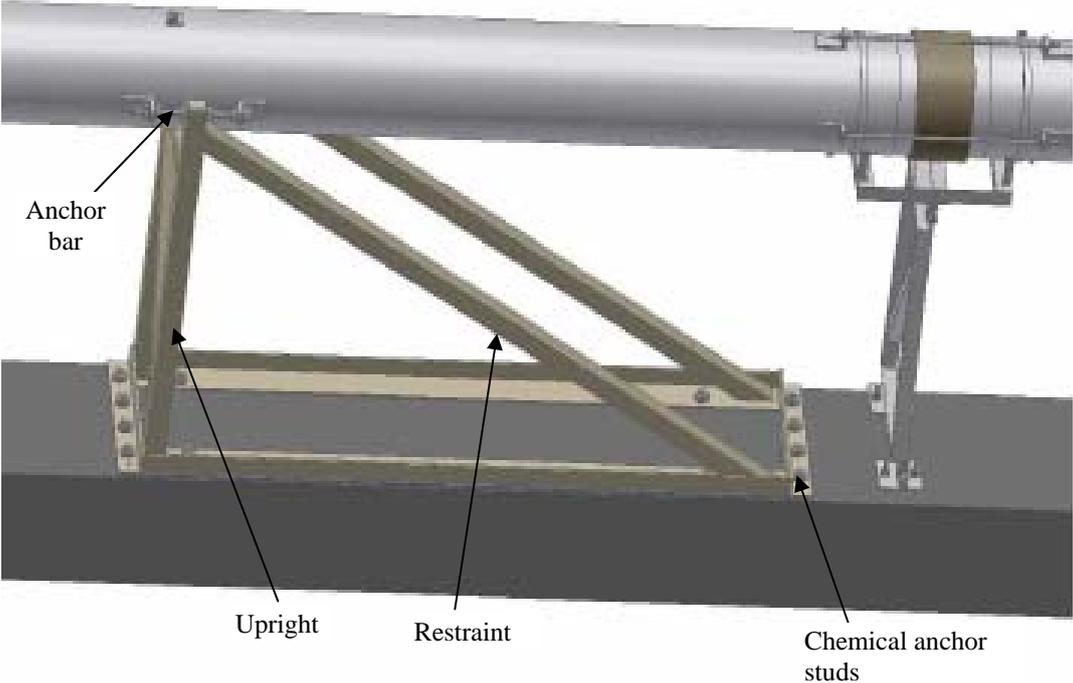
A 3D view of the delay line anchor showing the connections to the floor.
